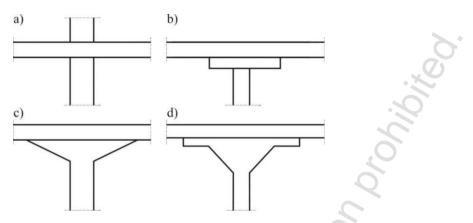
Connections of slabs and columns in slab-and-column ceilings: a) the slab ceiling of constant thickness; b) the slab ceiling with a head plate; c) the slab ceiling with a head (mushroom-shaped); d) the slab ceiling with a head plate and a mushroom head
